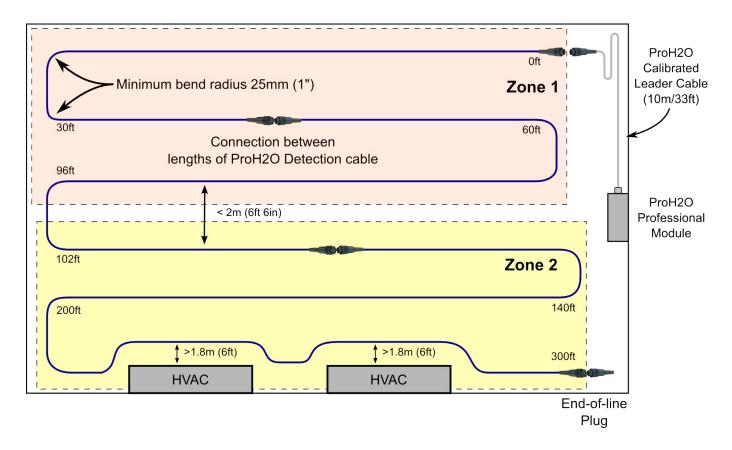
Typical Floor Layout of ProH2O Water Leak Detection Cable
